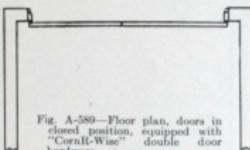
Floor plan, doors in closed position, equipped with "CornR-Wise" double door hardware.
